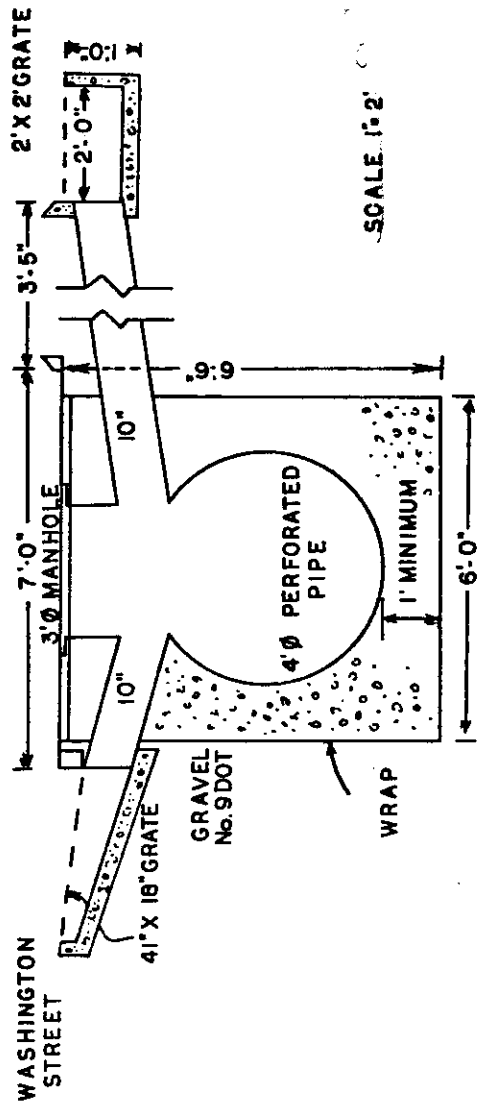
TYPICAL SECTION OF UNDERGROUND PERCOLATION SYSTEM
